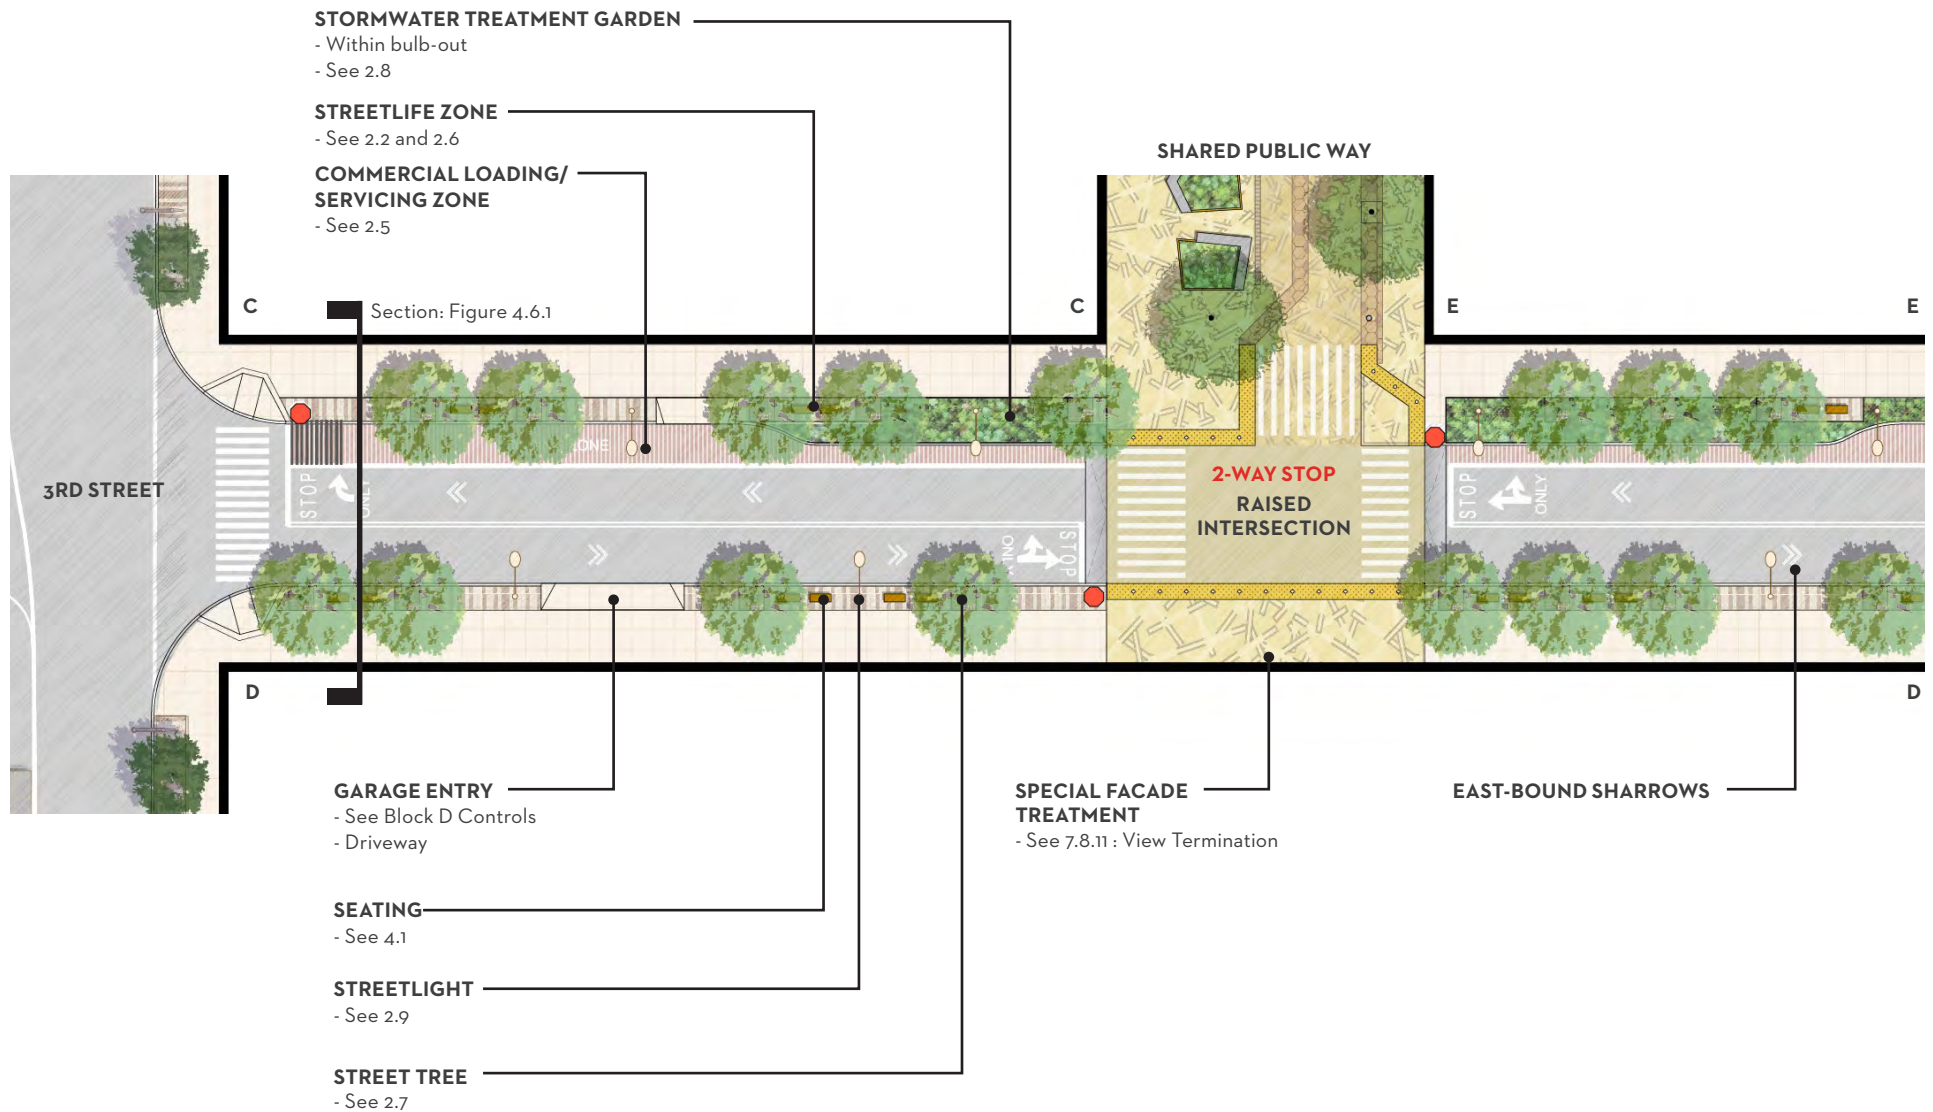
Long Bridge Street Conceptual Plan. This is provided for illustrative purposes only & does not represent a design proposal. Refer to Chapter 8 of the Infrastructure Plan for key dimensions, intersection analysis, and fire access information.
